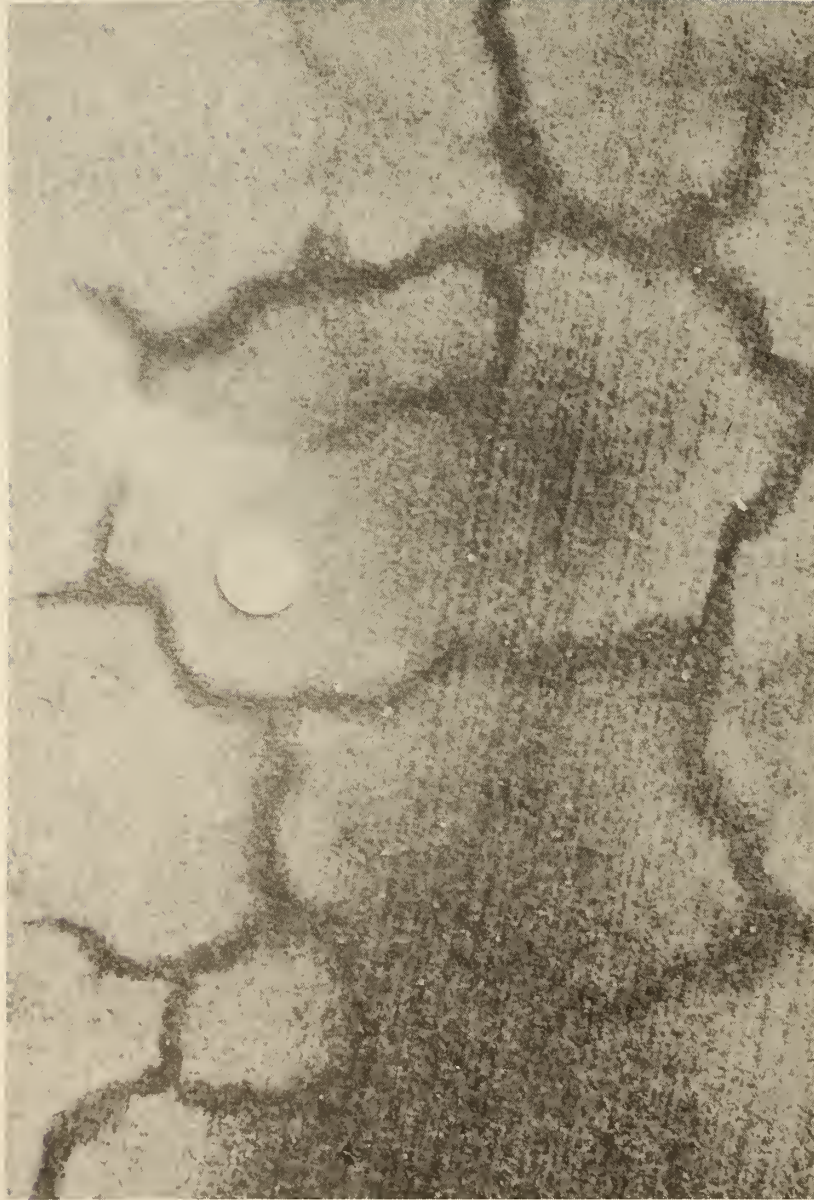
Water wet cracks in surface of treated bridge deck.
